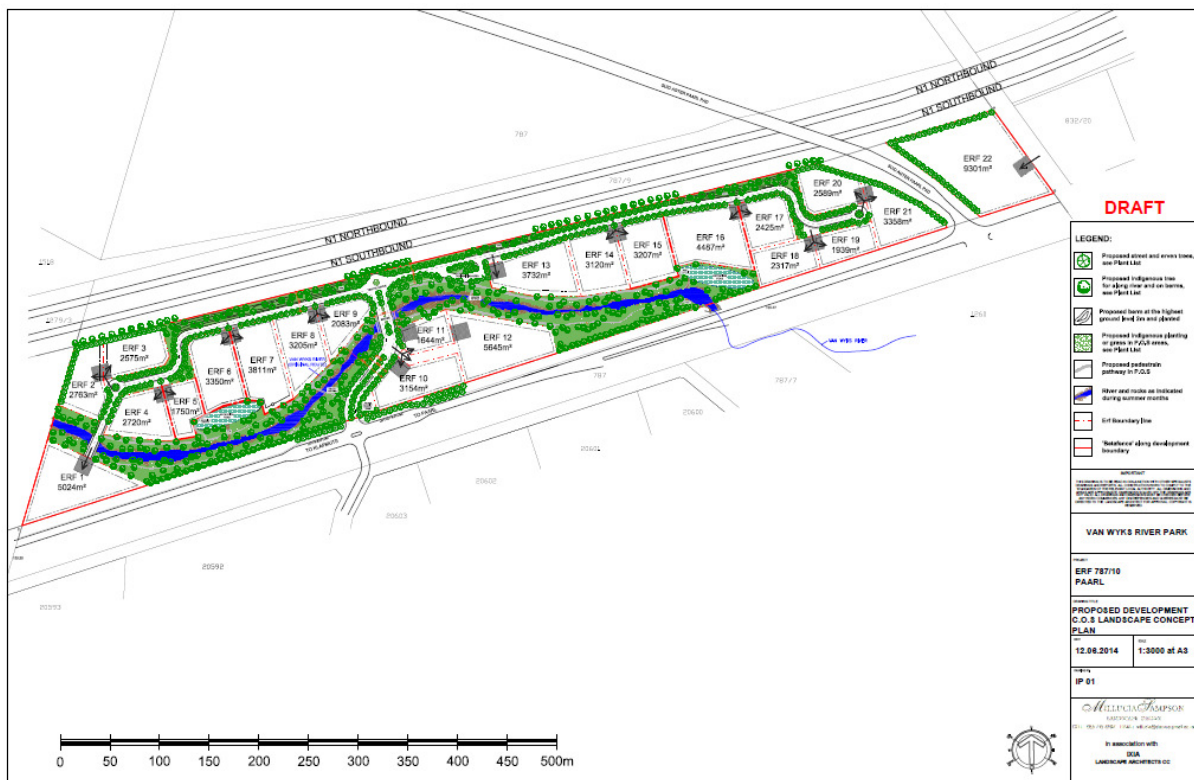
Proposed Landscape Concept Plan Rev 2 June 2014 (by Millucia Sampson in association with Ixia Landscape Architects)
